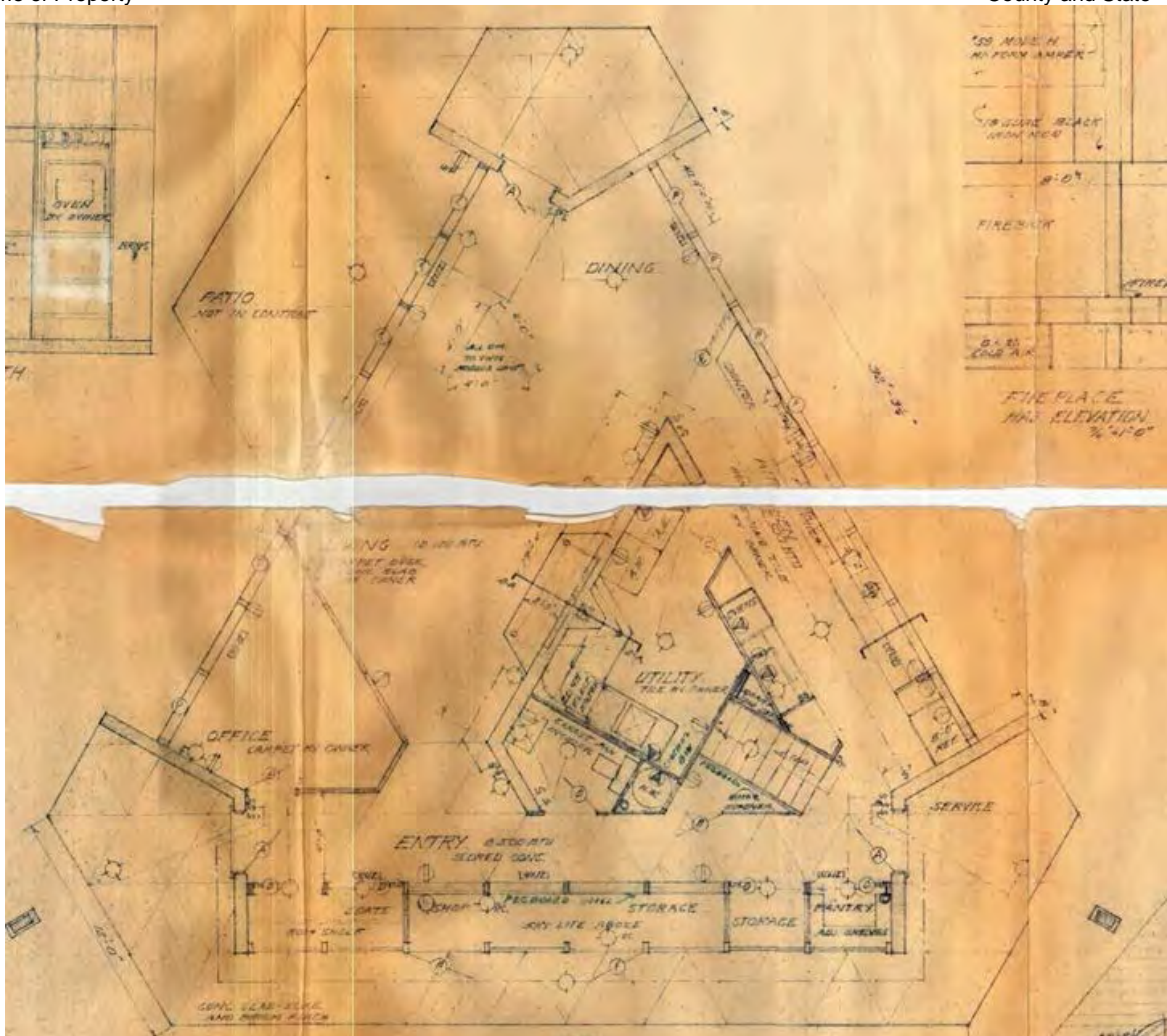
First-floor interior floorplan, depicting kitchen, utility room, living room, office, storage, and all first-floor entrances.
